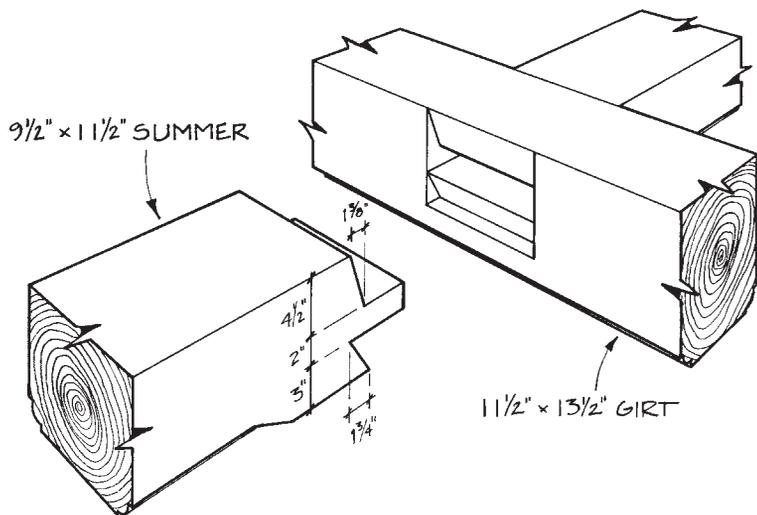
Summer beam to girt connection in the 1665 Gedney House, Salem, Massachusetts. Both members have molded chamfers.
